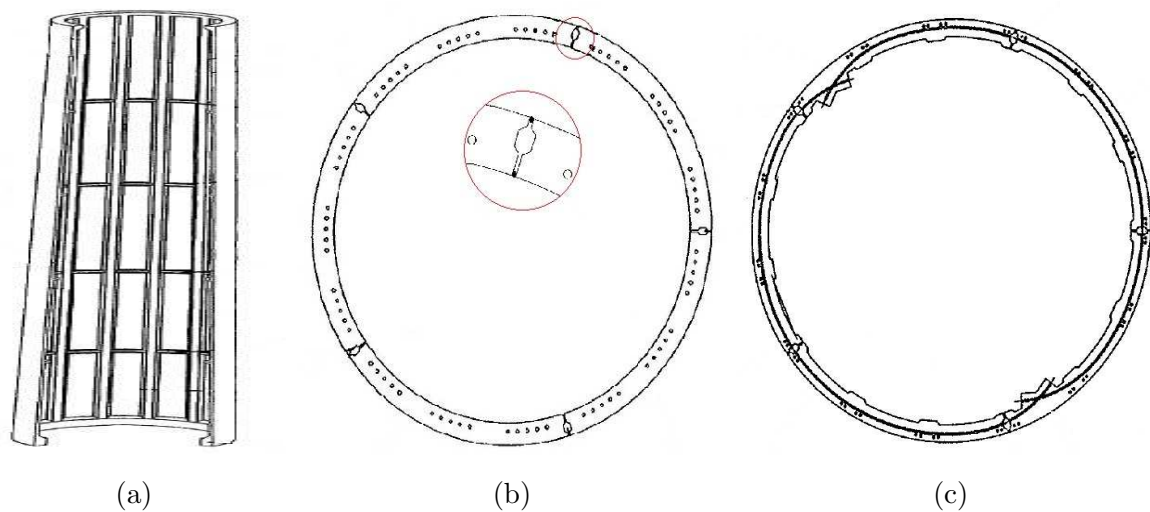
Prefabricated modular tower, taken from [31]; (a) longitudinal cross-section; (b) and (c) proposed horizontal cross-sections of ring segment
